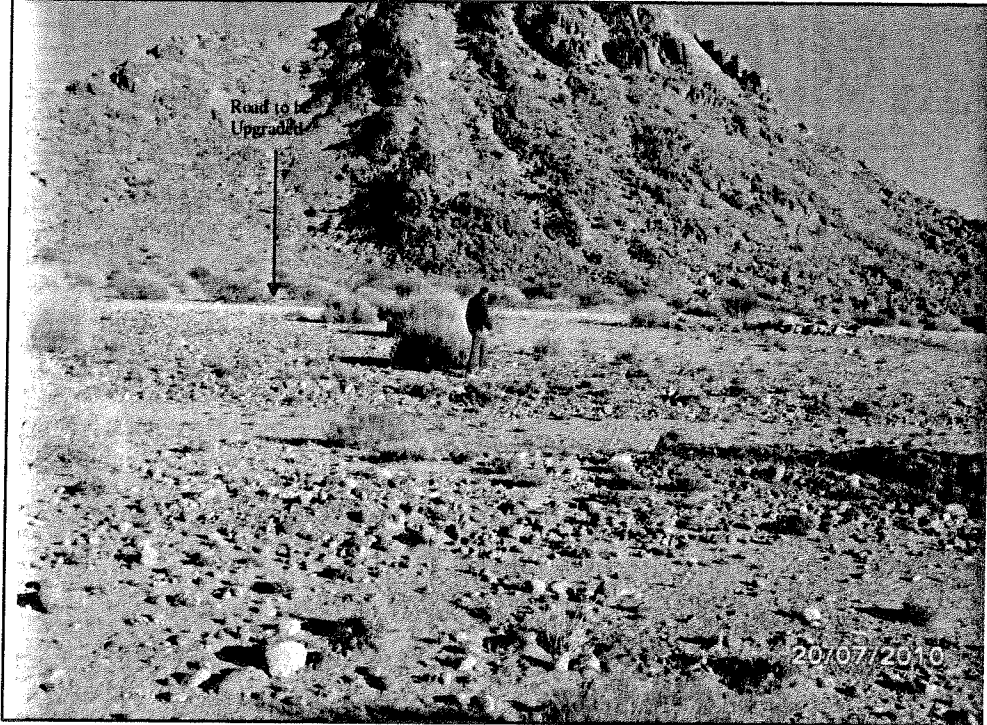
Showing the in a north western direction. The extension site is in the foreground with the existing burrow pit in the background.
